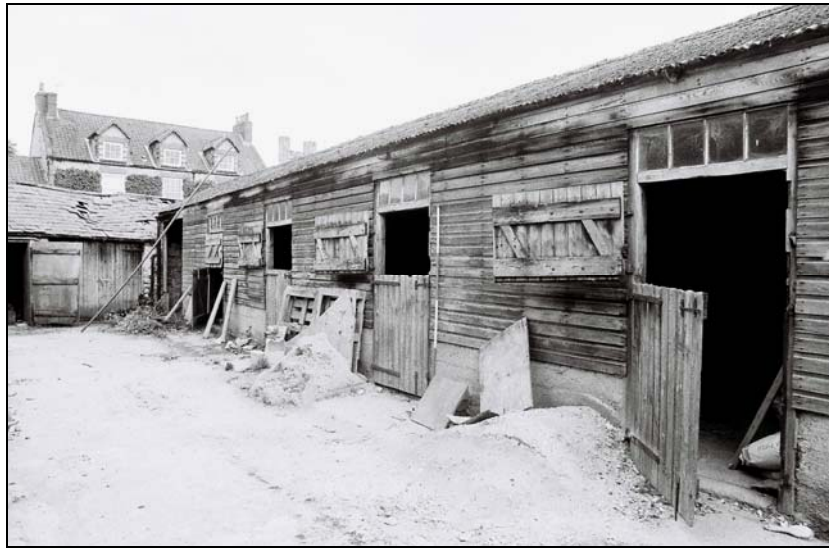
, 117: Building C, oblique view of the *Southeast Elevation*, from the east
